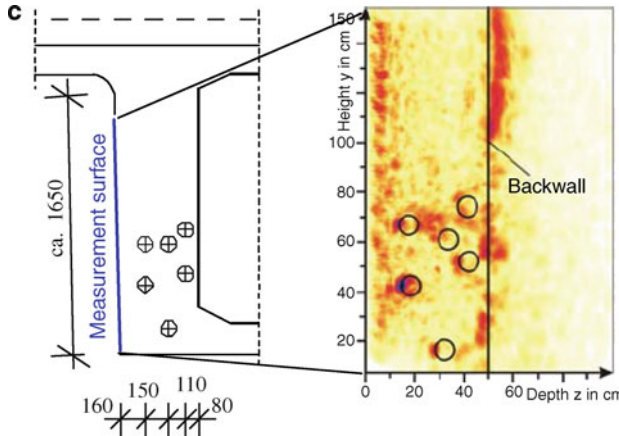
Arrangement of tendon ducts in the cross section of a box girder web, left: according to construction plan, right: located at a SAFT-B projection by ultrasonic echo [Wiggenhauser et al, 2007]
